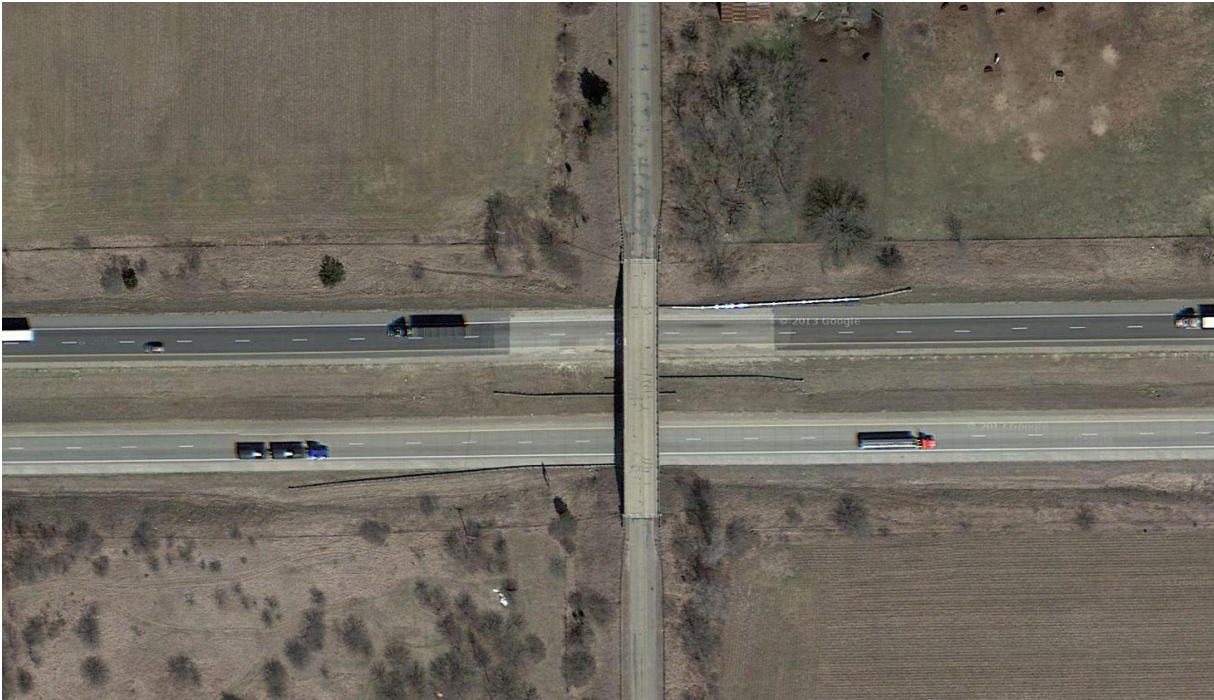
Satellite Image of 24 Mile Road Bridge Deck in Calhoun County, Michigan.
